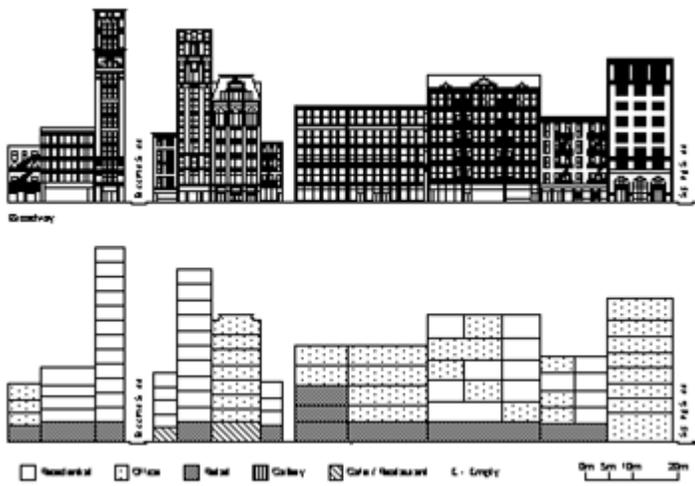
West elevation of Broadway, from Broom to Spring Streets, with cafes and restaurants adding Variety.
